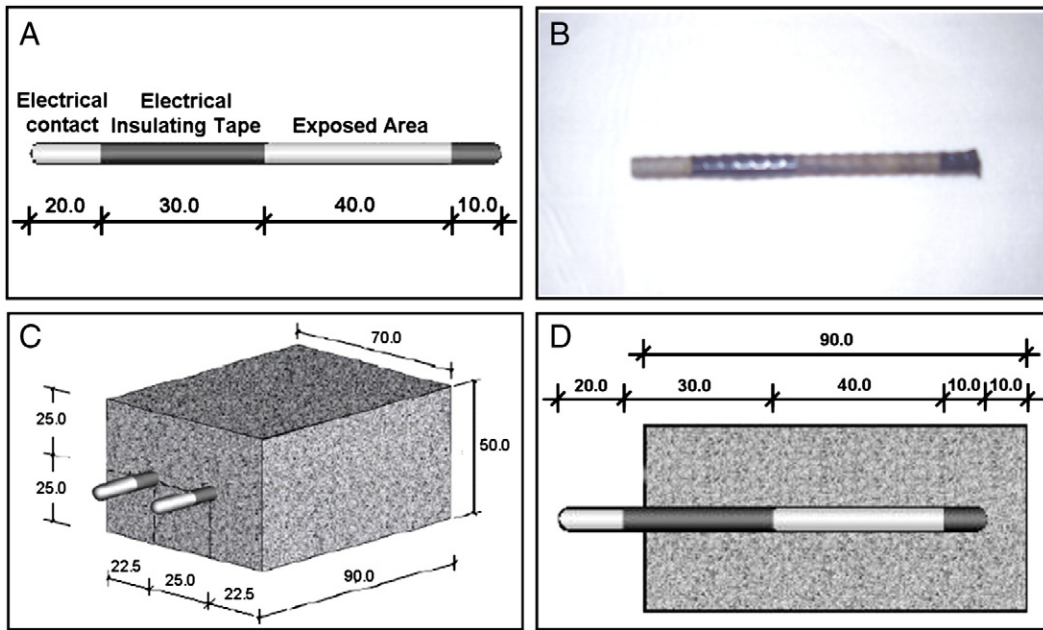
(A) and (B): Scheme of the exposed area of the rebar delimited (in mm), and (C) and (D): sample dimensions (in mm) and steel rebar positions in concrete samples.
